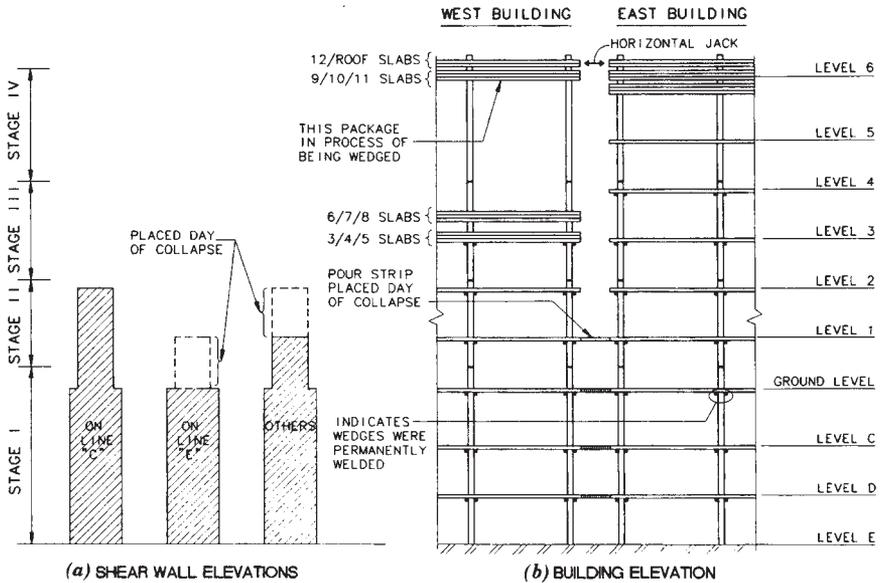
Elevation of L'Ambiance Plaza just before collapse.
